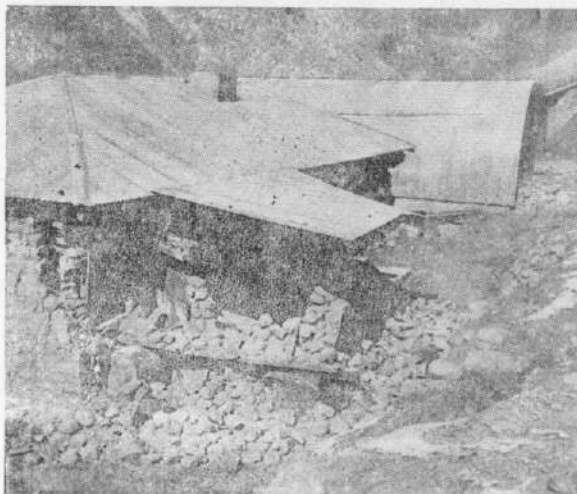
Collapse of RRSM of the Asstt. Engineer's residence, Semicircular shed (P.W.D. store) seen in the background did not suffer any damage except the collapse of the stone masonry side walls.
